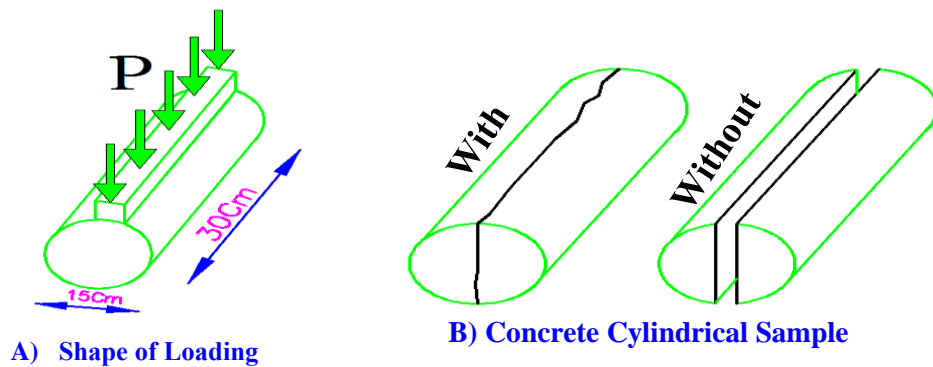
Shape of loading on the concrete cylinder of the splitting test
